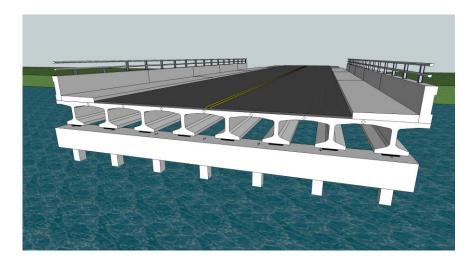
Adjacent Deck Bulb Tee Beam Superstructure
